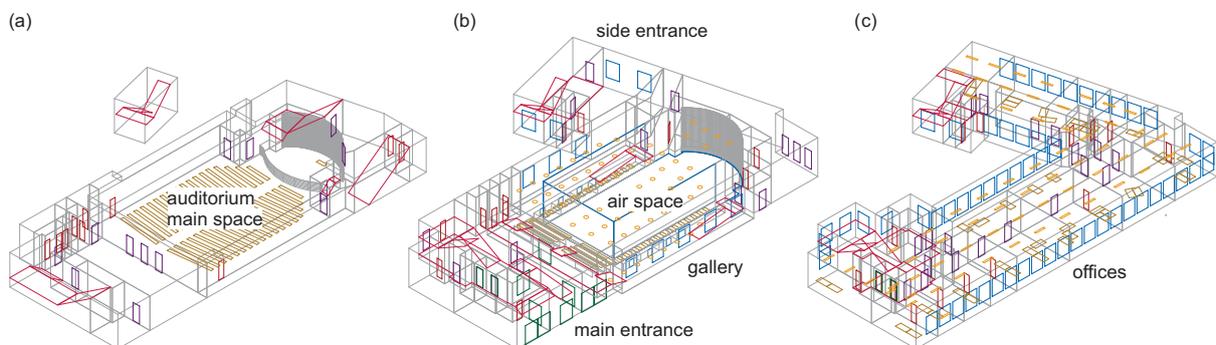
Architectural layout of the test building: (a) Basement Floor, (b) Ground Floor, (c) First Floor.
